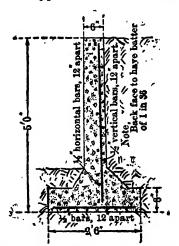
A Reinforced-concrete Retaining-wall, 5 ft High
